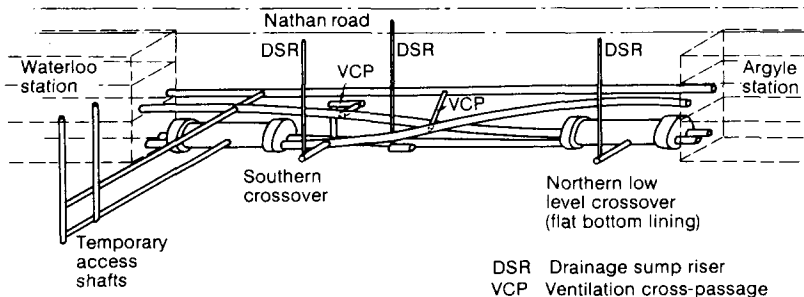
North Nathan Road tunnels: Waterloo to Argyle
